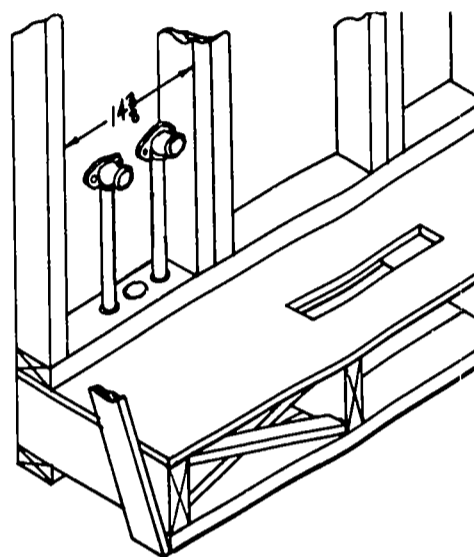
Measuring for Backing Board (5" nipples are removed.)
